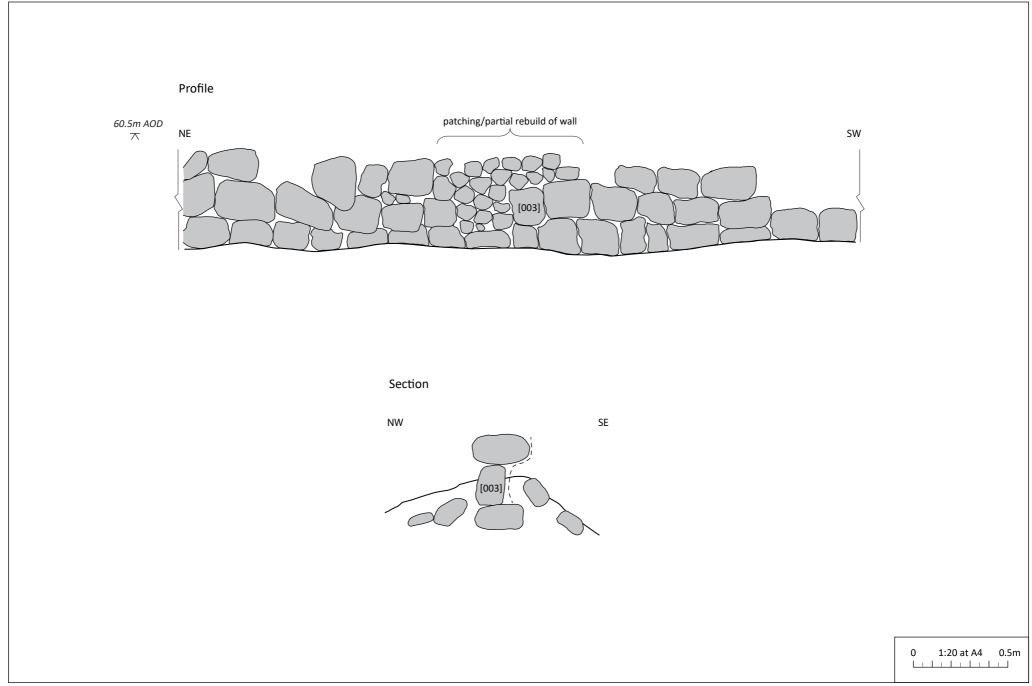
NW facing profile and SW facing section through Historic Boundary Wall [003]
